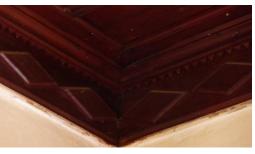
Ceiling detail from the first floor in 11-Hamam Street
